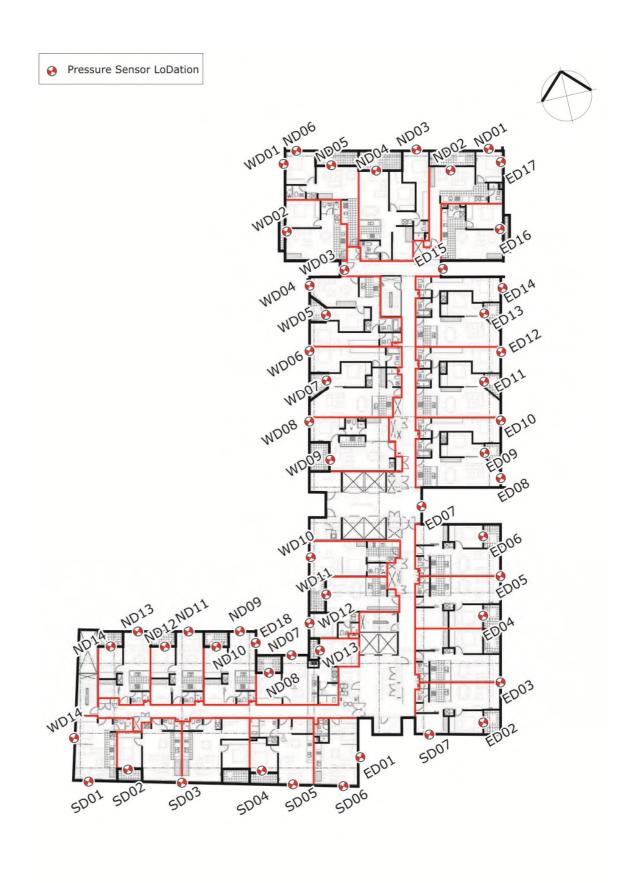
Opening Locations and Internal Apartment Layout - Level 11
